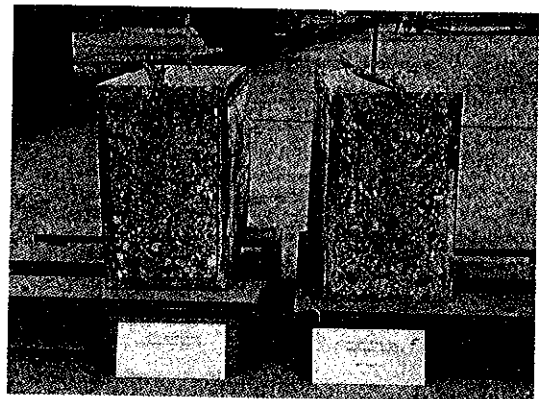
Cross cut section of specimens after their resistant tests. The left side photo from the front face shows the air-cell specimen and the right side photo shows the turtle-back wire net specimen.
